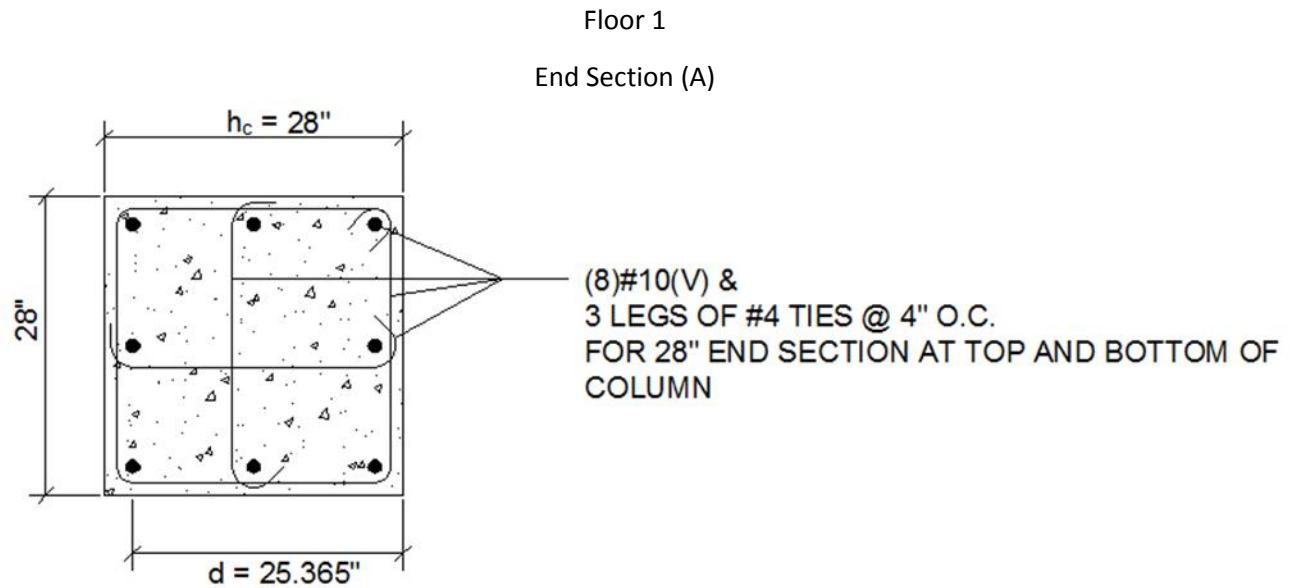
Exterior column, cross-section at end of column at ground floor level based on SDC D design.
